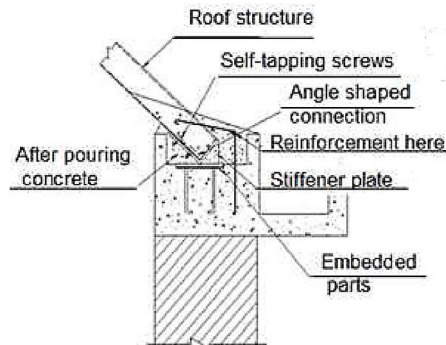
Fixing the arches in concrete (option not taken) [34]
